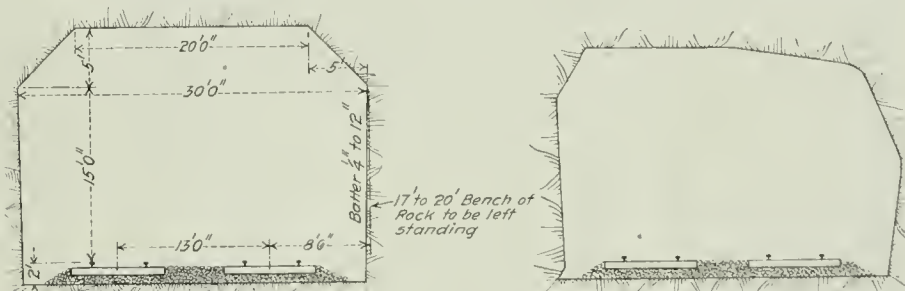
Section of Old and New Nay Aug Tunnels; New Tunnel on the Left.
